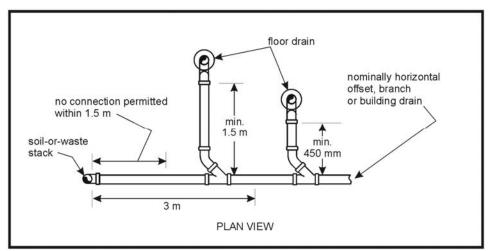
(5) Soil-or-Waste Pipe Connections
